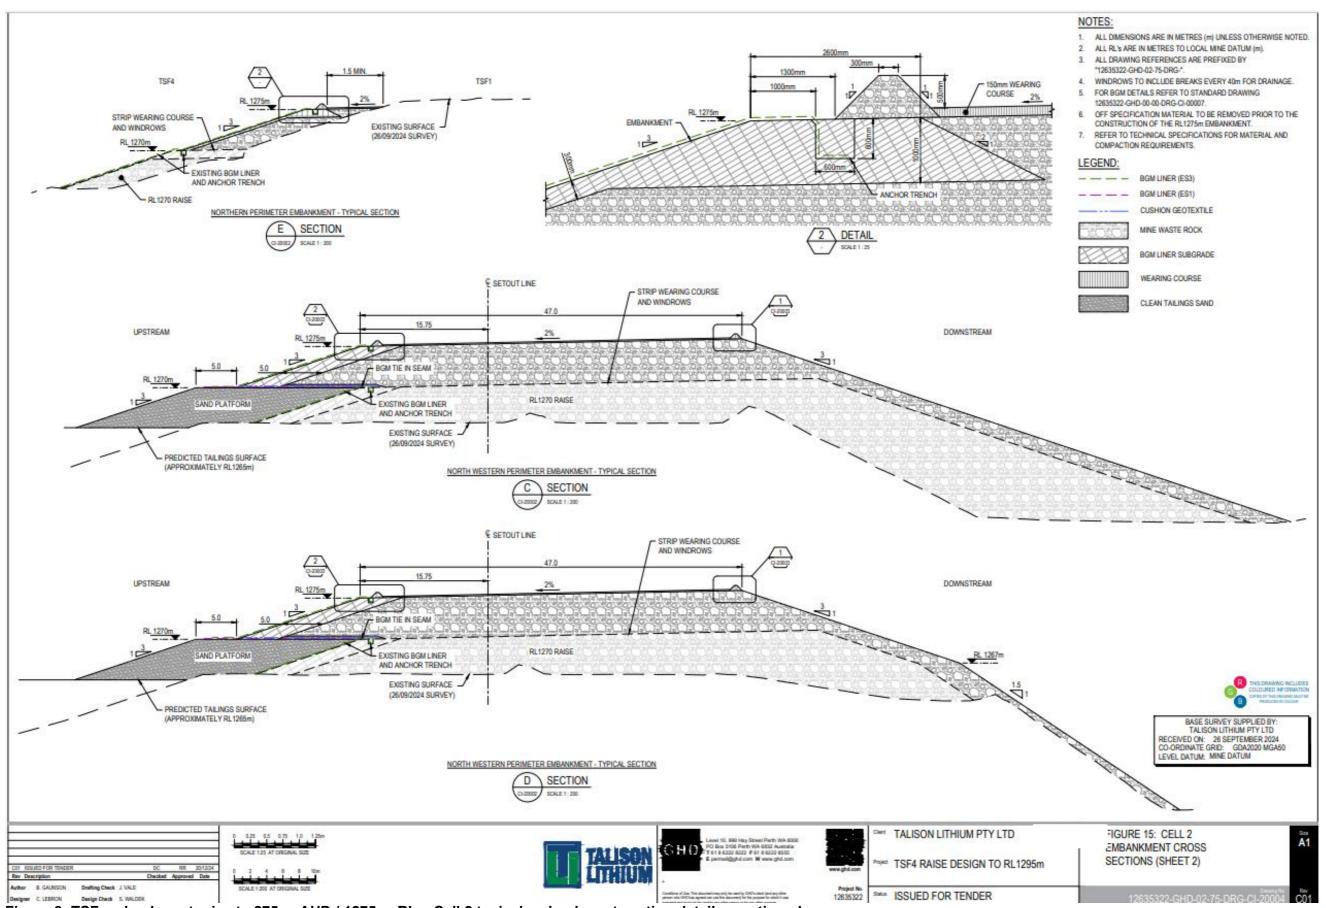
TSF embankment raise to 275 m AHD / 1275 m RL - Cell 2 typical embankment section detail - continued
